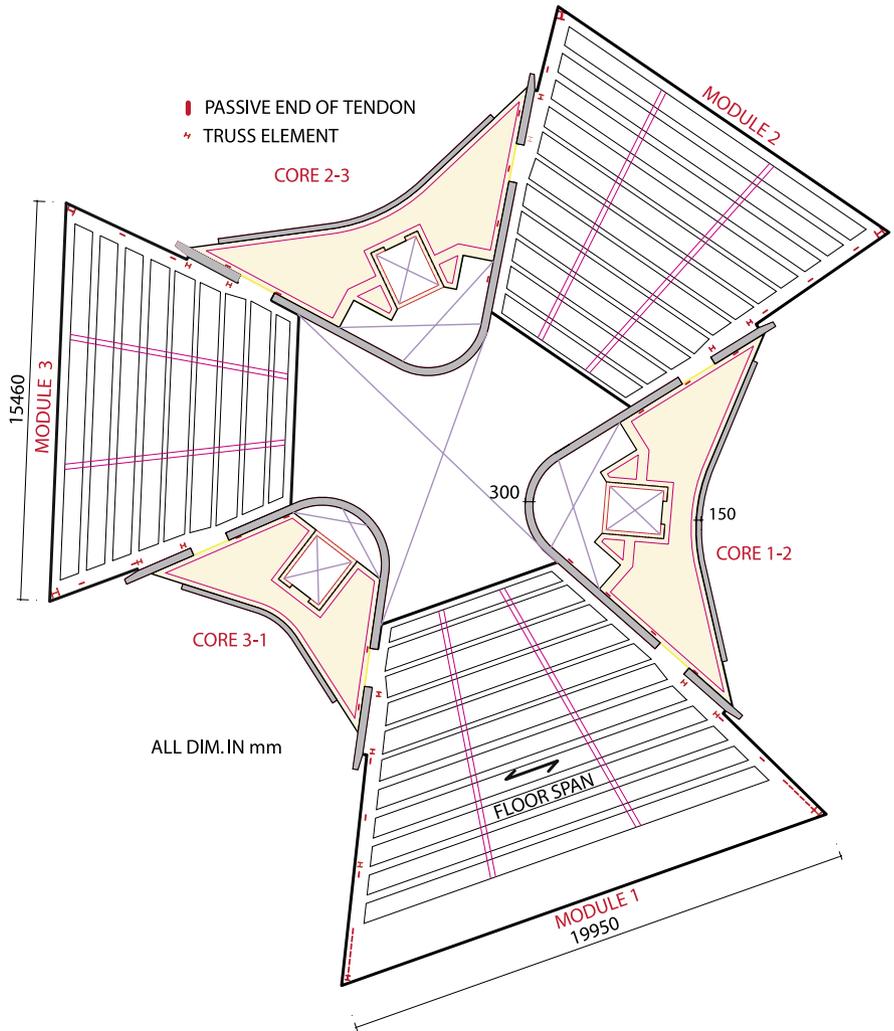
Typical floor plan illustrating the complex geometry of the structure
